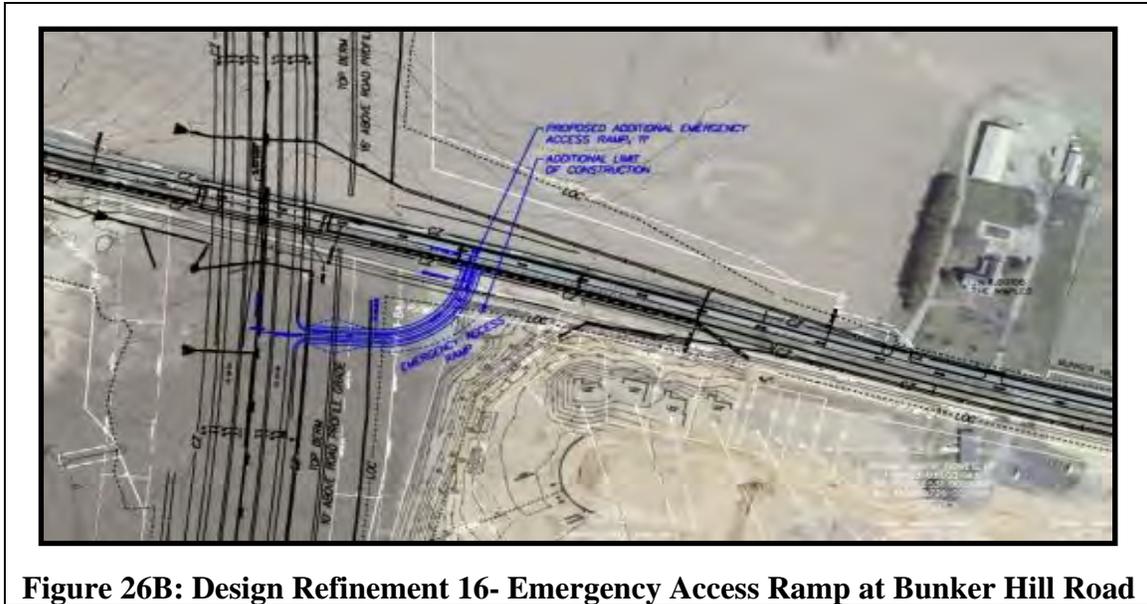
B: Design Refinement 16- Emergency Access Ramp at Bunker Hill Road
